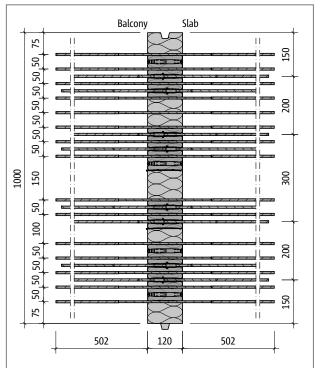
Schöck Isokorb® XT type K-M5-VV1: Product plan view
